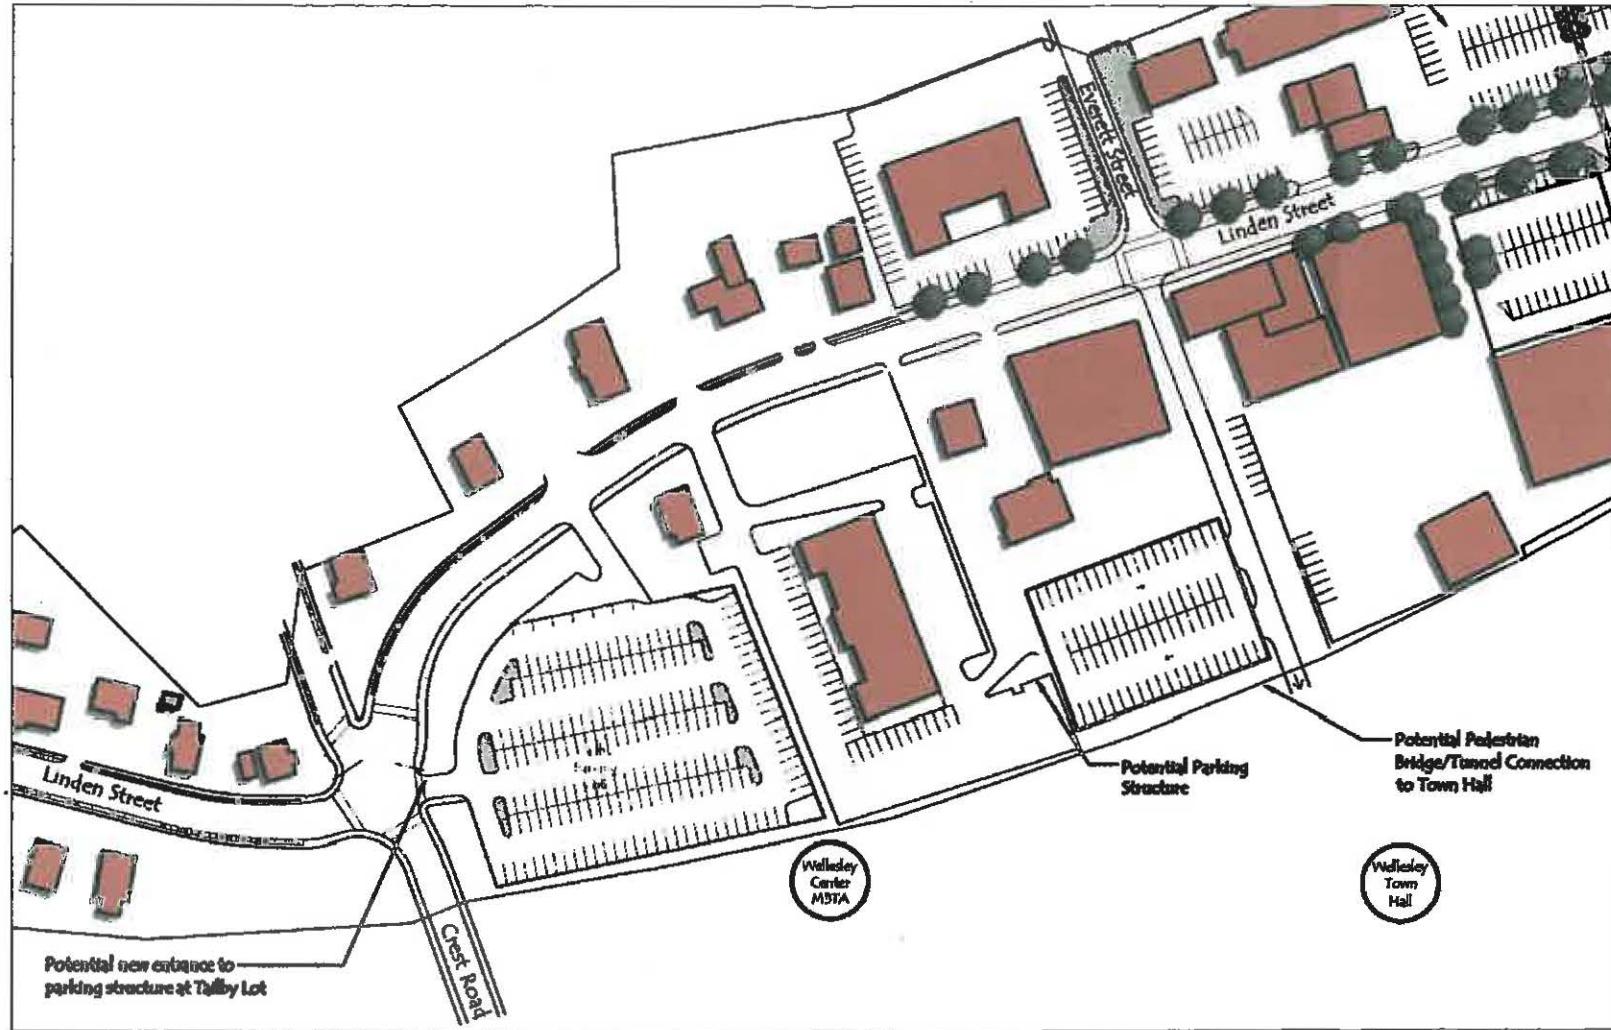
A: Linden Street Corridor Improvement Plan - Kingsbury Street to Everett Street
